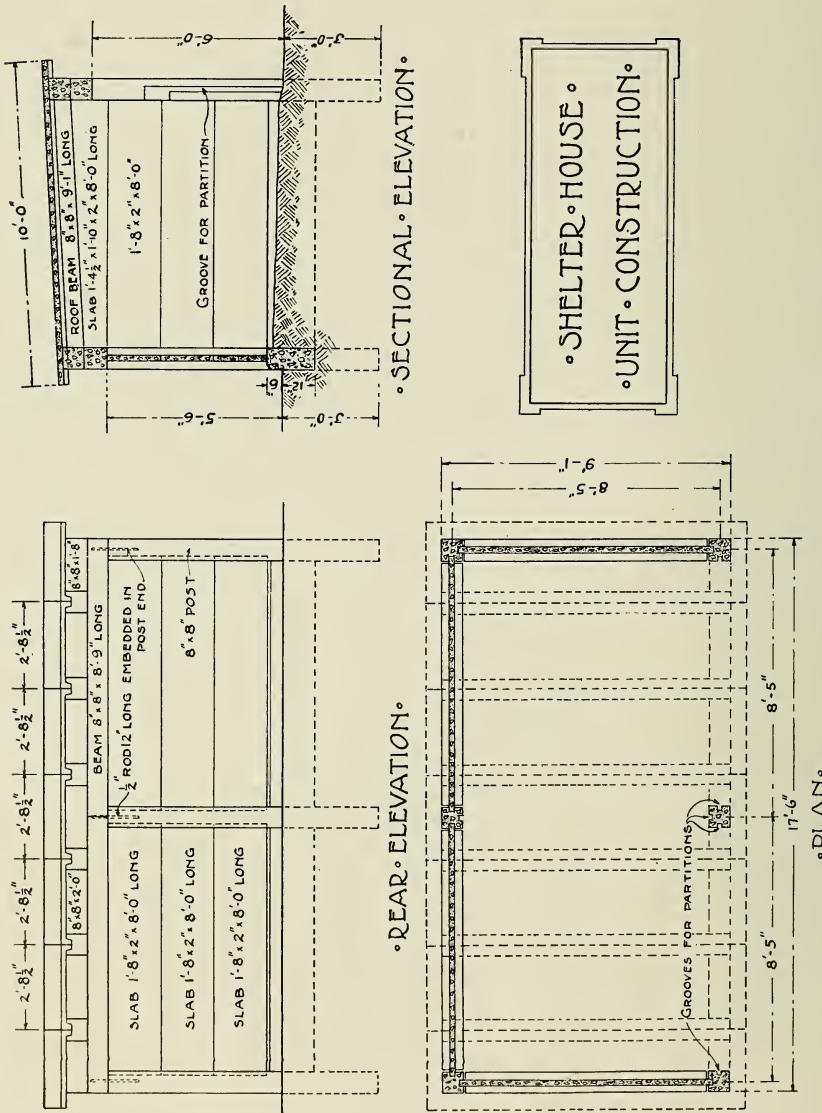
A Concrete Shelter House of unit construction, cheap and portable.
